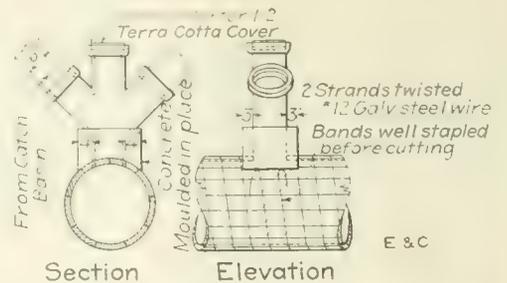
Details of Double Catch Basin Connection for Wooden Stave Pipe.
